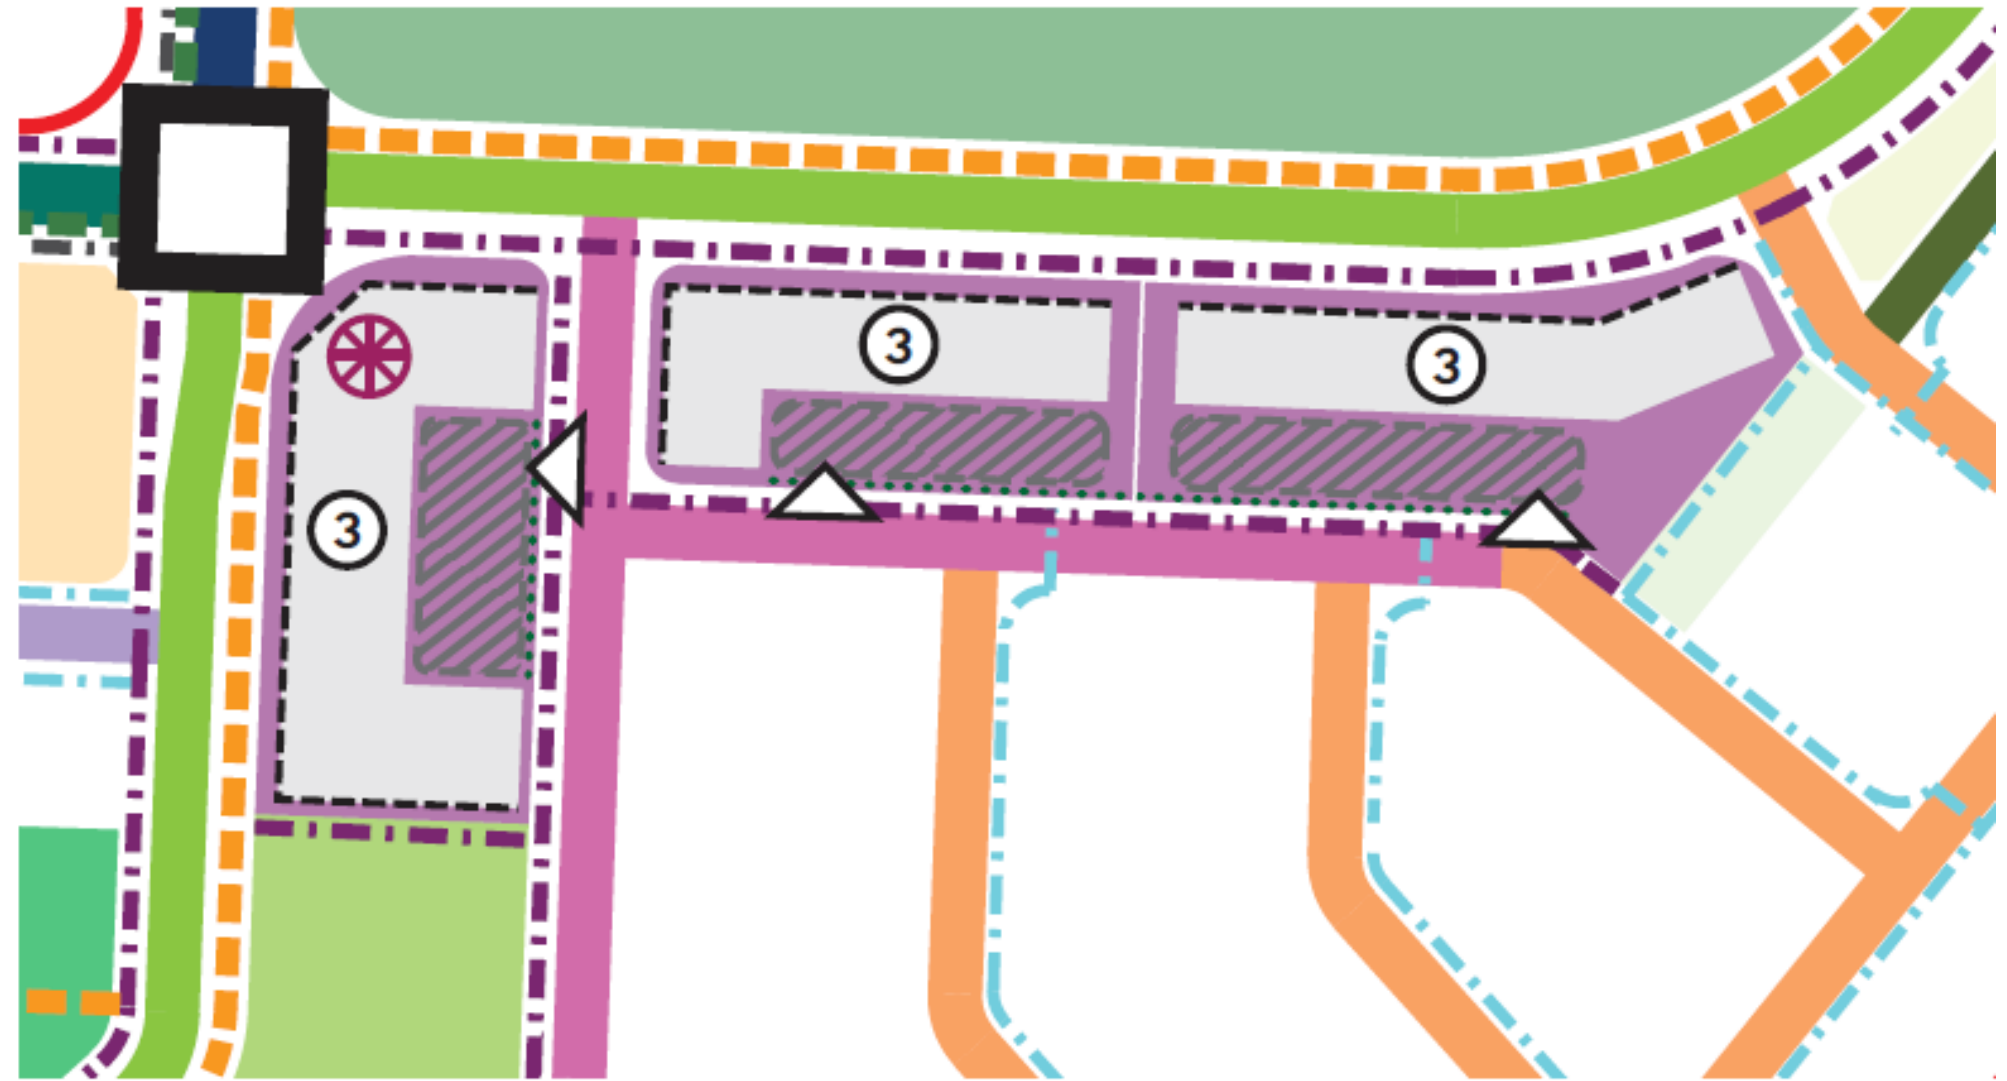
Lot 8001, 8002 and 8004 - Plan of Development
